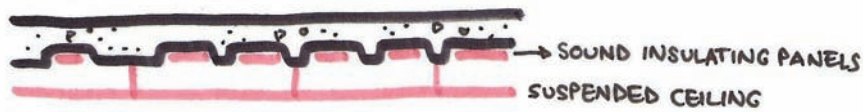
The walkway ceilings in front of the lecture hall should have sound insulation panels and a suspended ceiling (Author, 2011).
